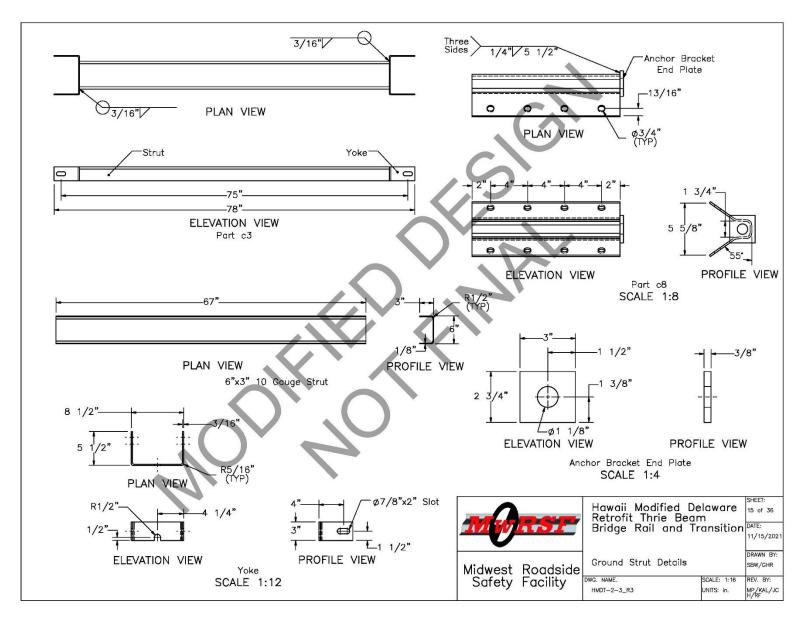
Ground Strut Details, Test Nos. HMDT-2 and HMDT-3
